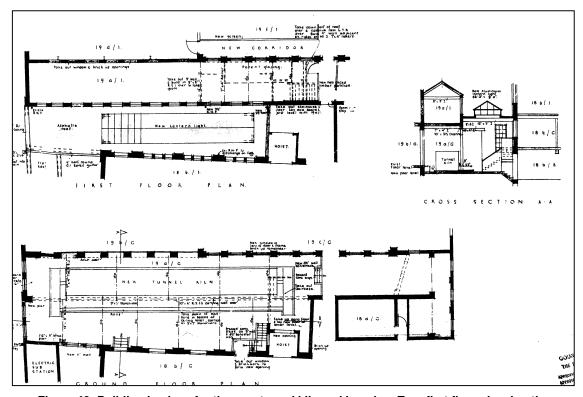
Building L, plans for the new tunnel kiln and housing. Top: first floor showing the retention of the central dividing wall. Bottom: ground floor showing the removal of the dividing wall. Right top: east elevation with the lantern light and loft.³⁴
